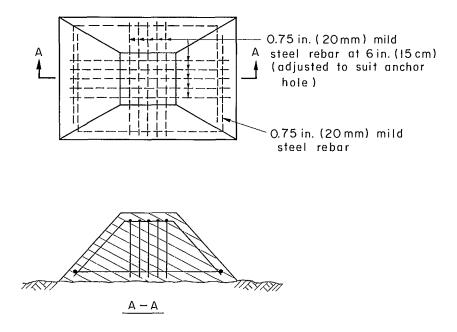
Layout of reinforcement for a concrete bearing block.
